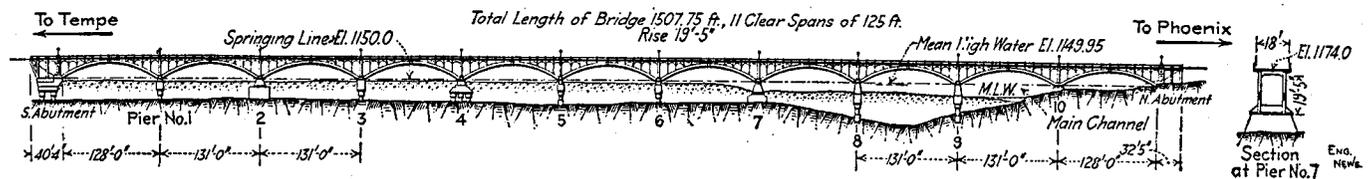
OUTLINE ELEVATION OF THE TEMPE REINFORCED-CONCRETE BRIDGE ACROSS THE SALT RIVER, NEAR PHOENIX, ARIZ.
